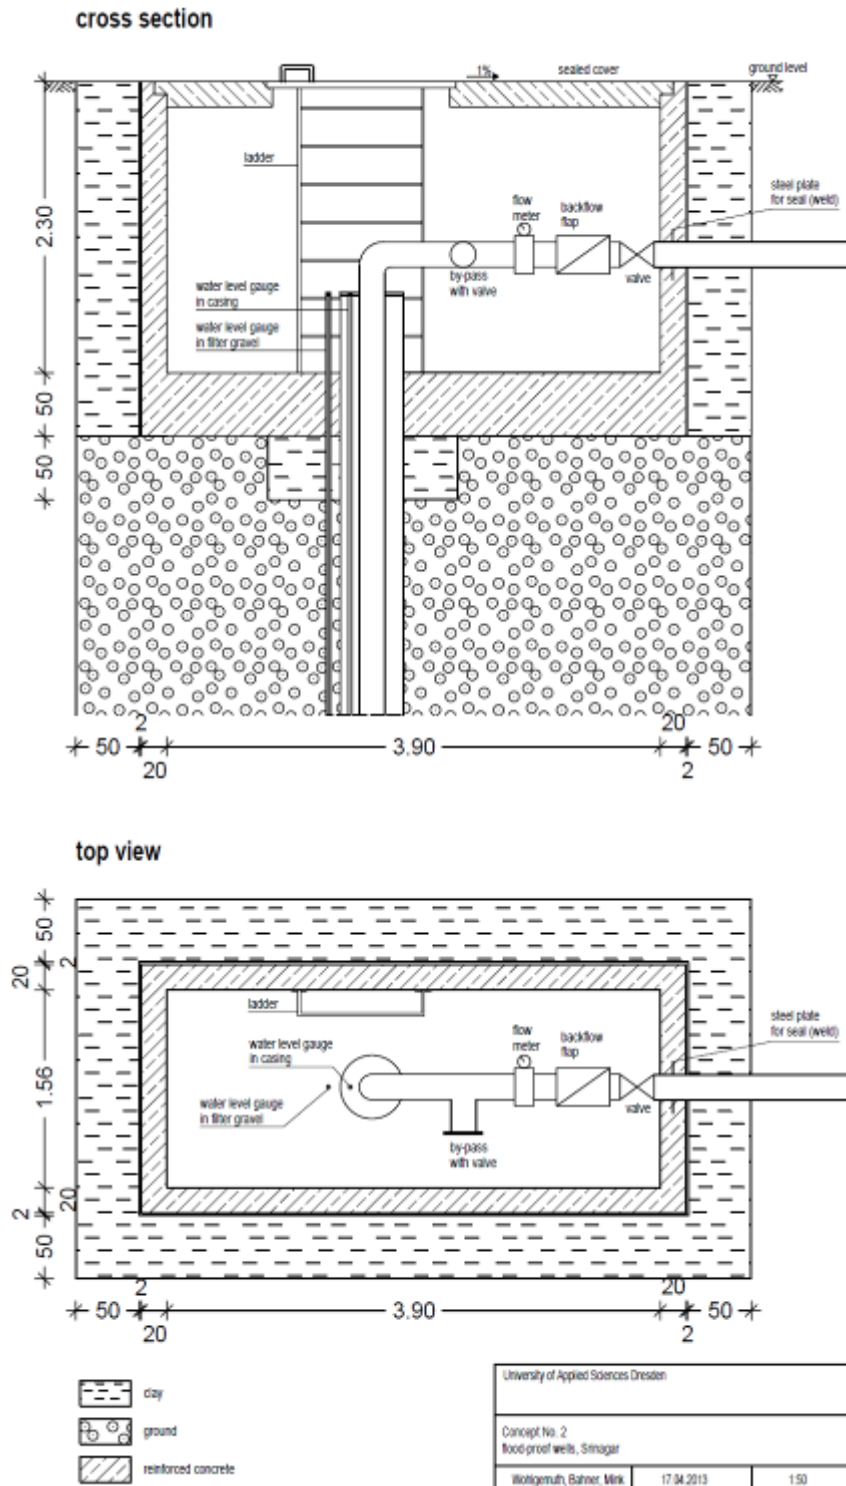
Design 3 – Subsurface reinforced concrete well chamber (Saph Pani, 2013)
